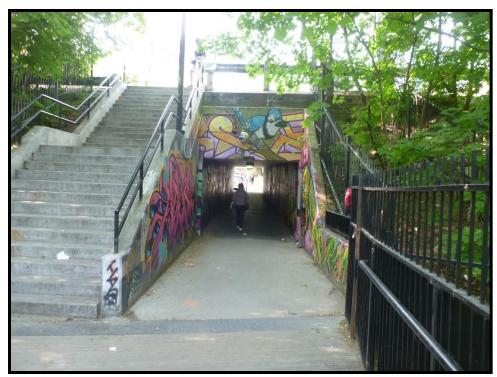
South access to bridge, underpass beneath Bloor Street East facing south
